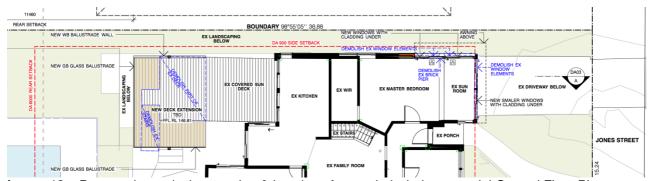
Proposed rear deck extension & location of amended windows, partial Ground Floor Plan
